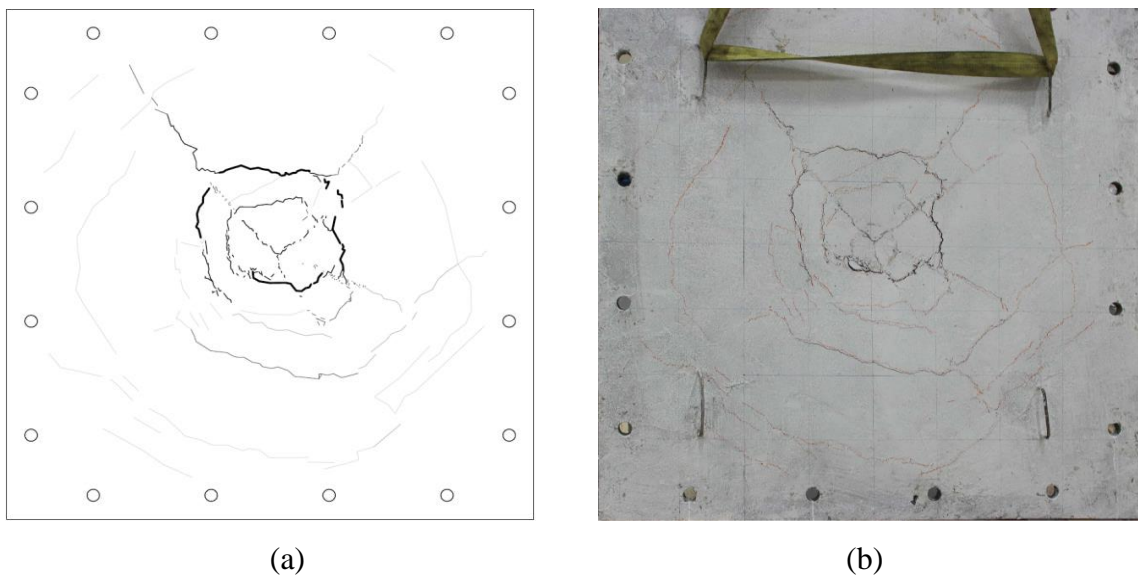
Top surface crack patterns after testing for panel JN1-075 +PVA
